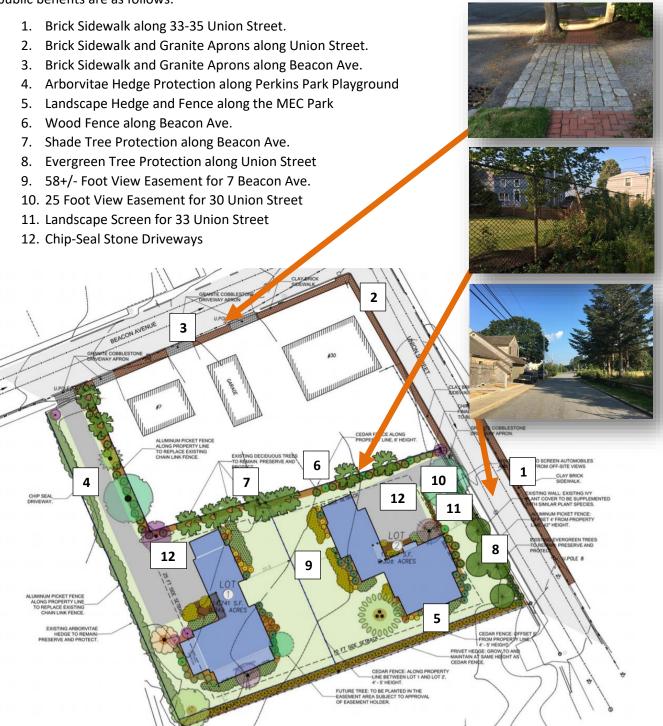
Public Benefits shown on the Proposed Subdivision Plan
